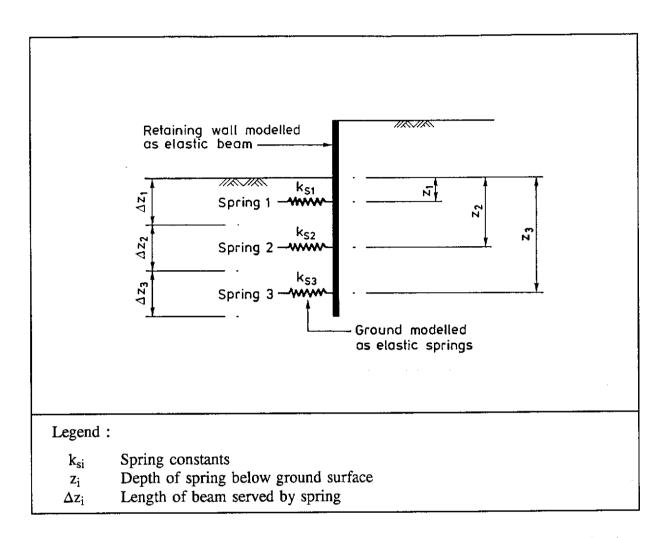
Winkler's Model for Cantilevered Sheet Retaining Wall Analysis
